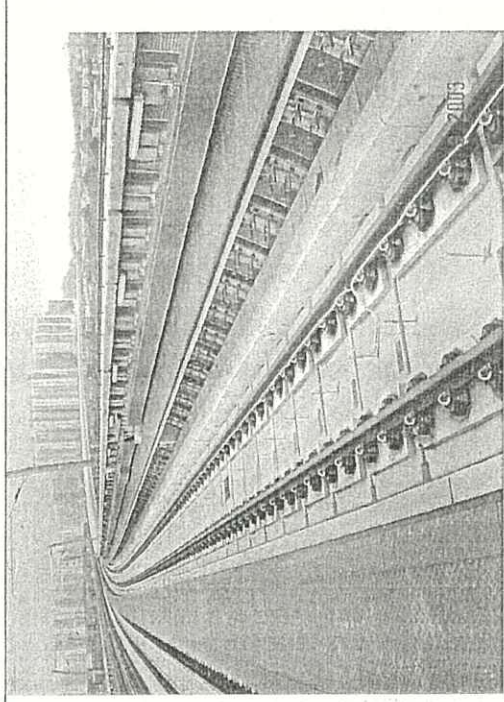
Floating Slab Trackform(FST) from Tin Shui Wai
